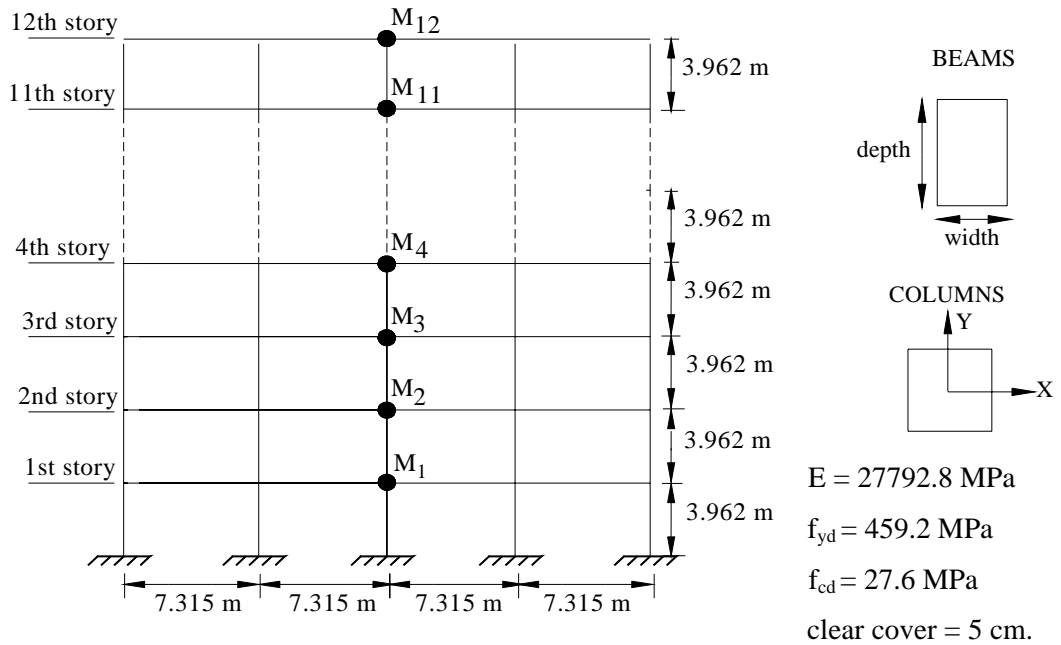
The Configuration of 12-Story Reinforced Concrete Frame
